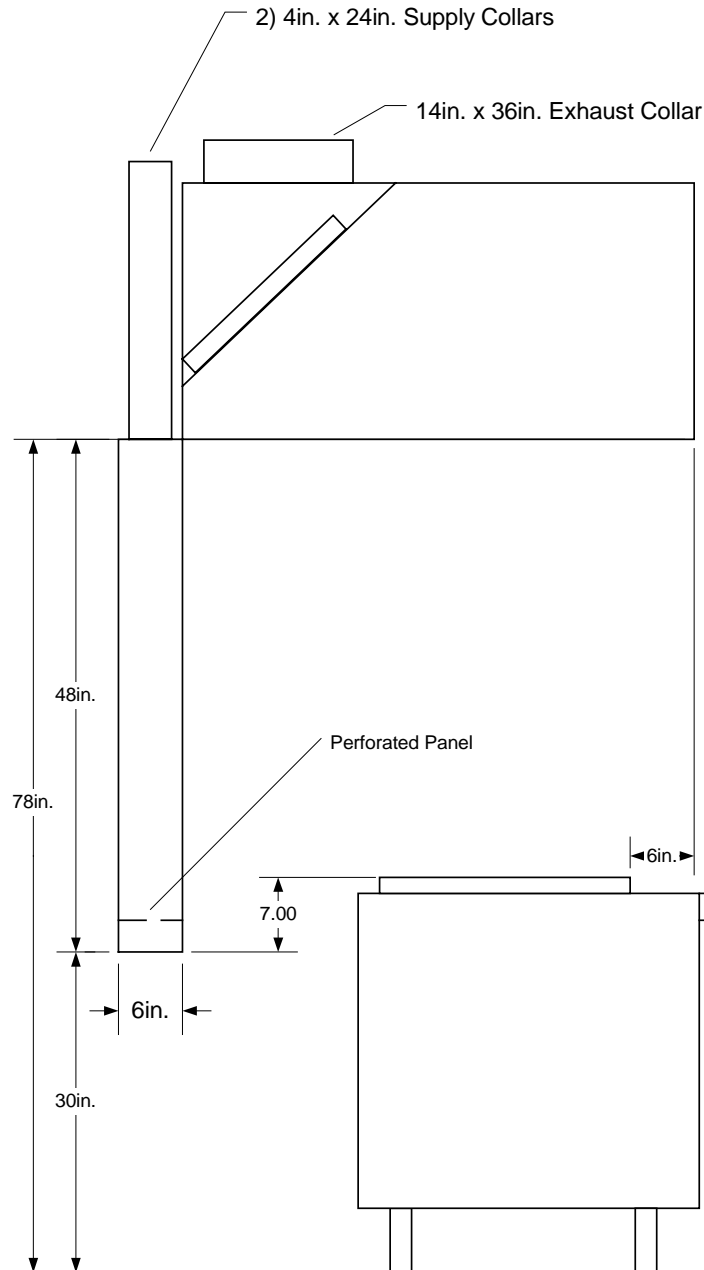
Cross-Sectional Drawing of the Wall Mounted Backwall Supply Canopy Hood
